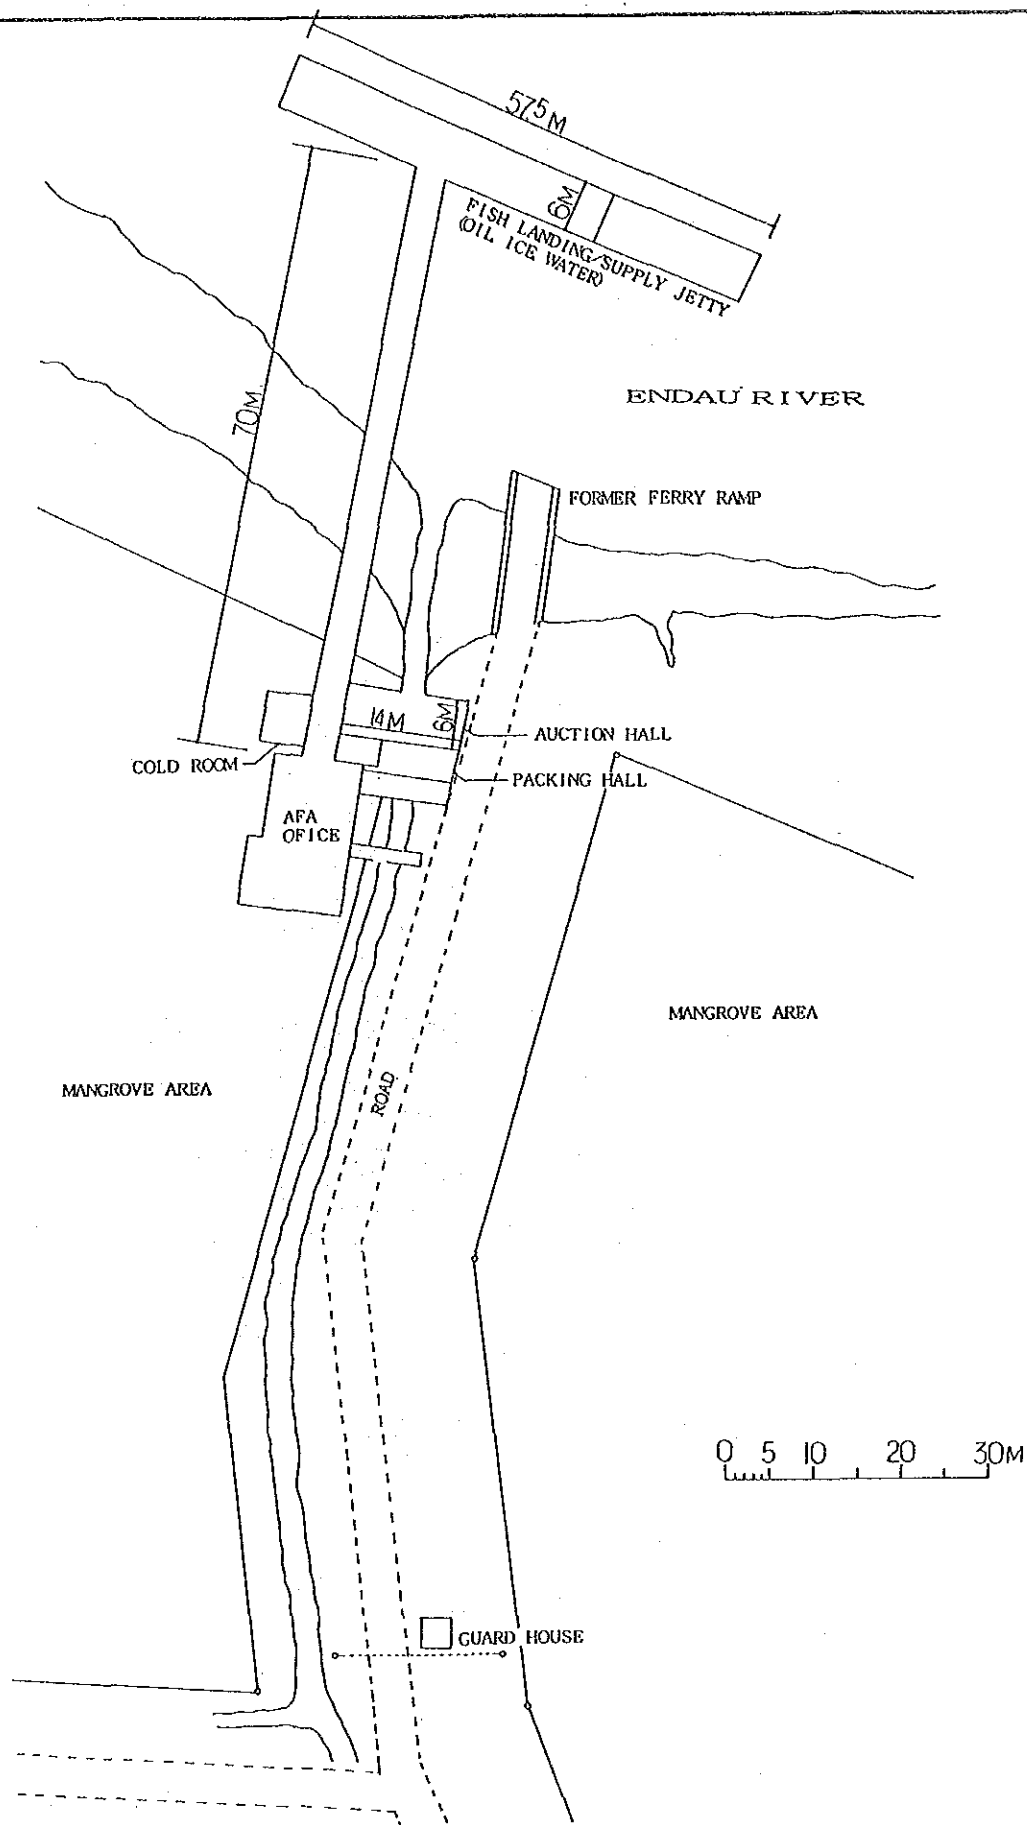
General Layout Plan of LKIM Complex of Endau
